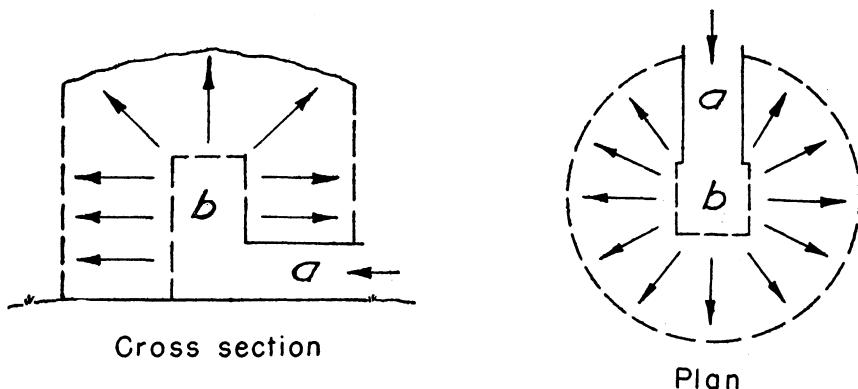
Cross section and plan of a round snow-fence crib showing preparation for forced ventilation. Intake duct (a) should be airtight; air blown into ventilator (b) escapes through corn as shown.
